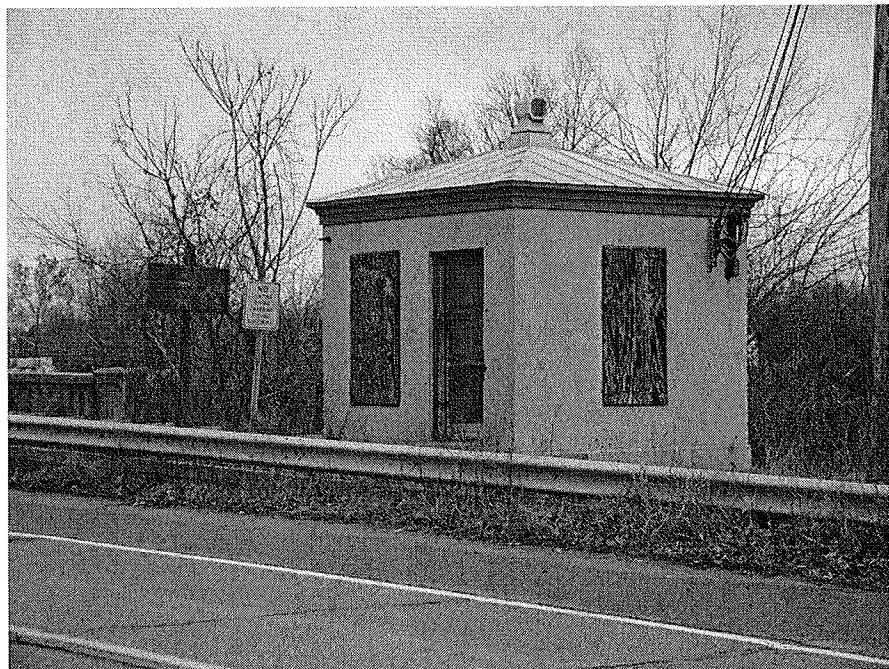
View from the northeast corner of Site 15G looking southwest.
